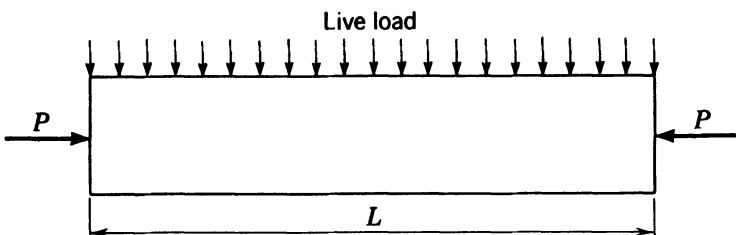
Simple rectangular beam prestressed concentrically.
